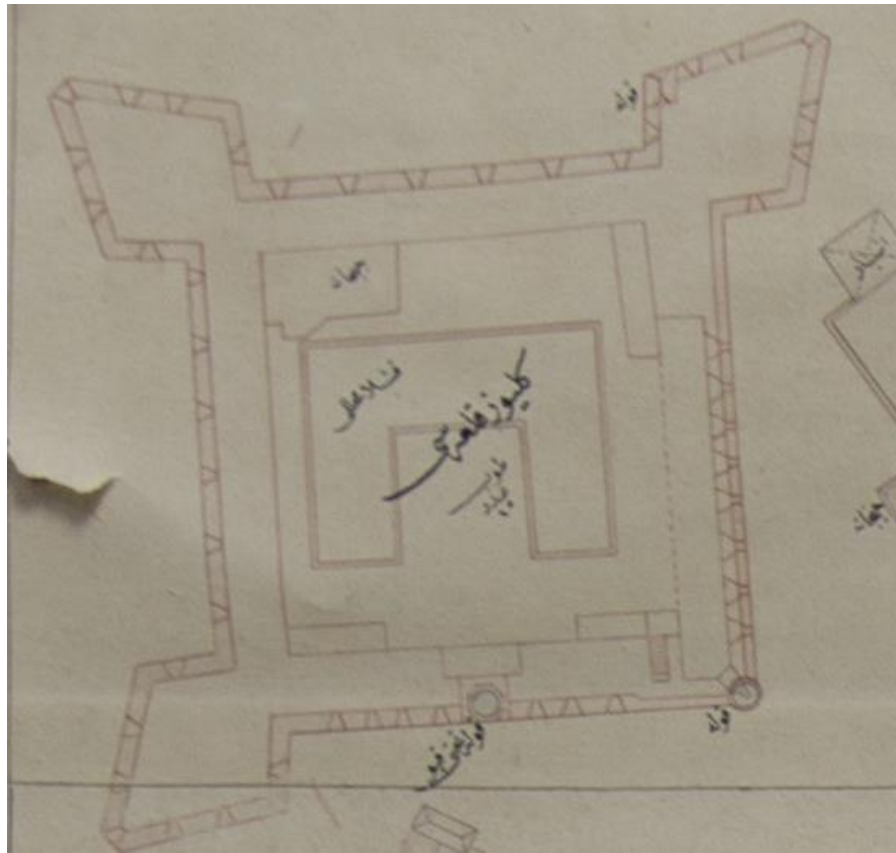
Plan of Kilyos Fort (TSM.A.E. 9444/1)
